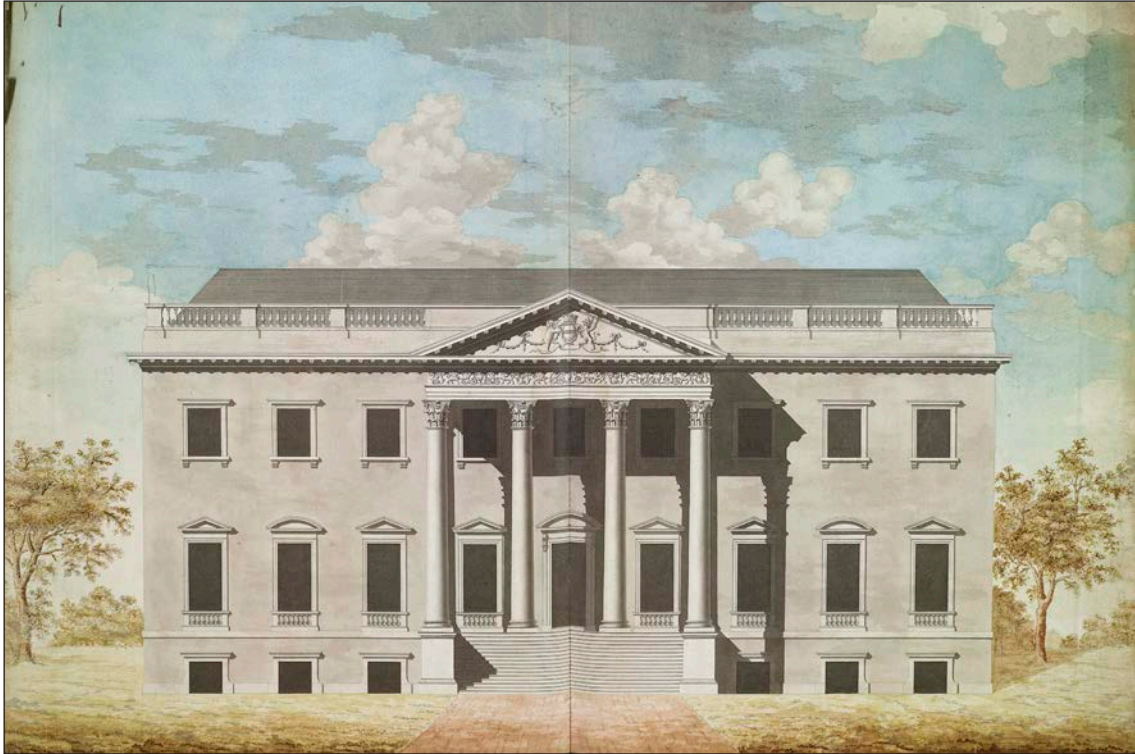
Elevation of the entrance façade, Claremont House, Surrey, 1771 RIBA VOS/120 (Copyright: RIBA Collections, RIBA PIX Ref No RIBA35746)
